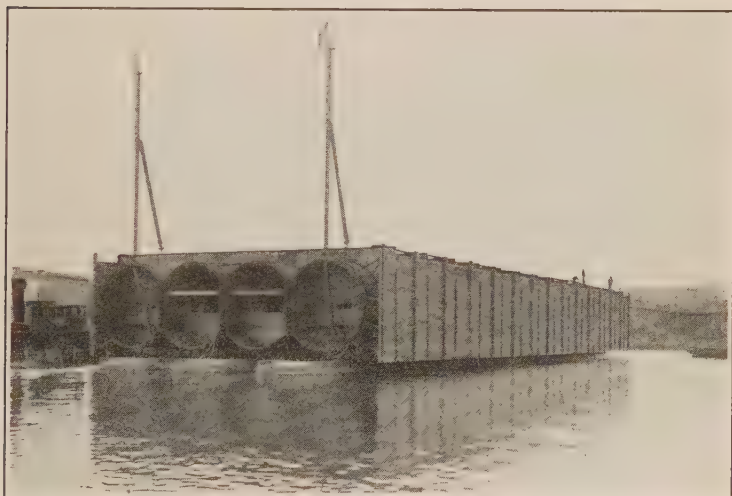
SECTION OF THE STEEL TUBES FOR THE NEW HARLEM RIVER TUNNEL OF THE LEXINGTON AVENUE SUBWAY AFTER LAUNCHING, READY TO BE TOWED TO THE SITE OF THE TUNNEL AND SUNK IN PLACE.
